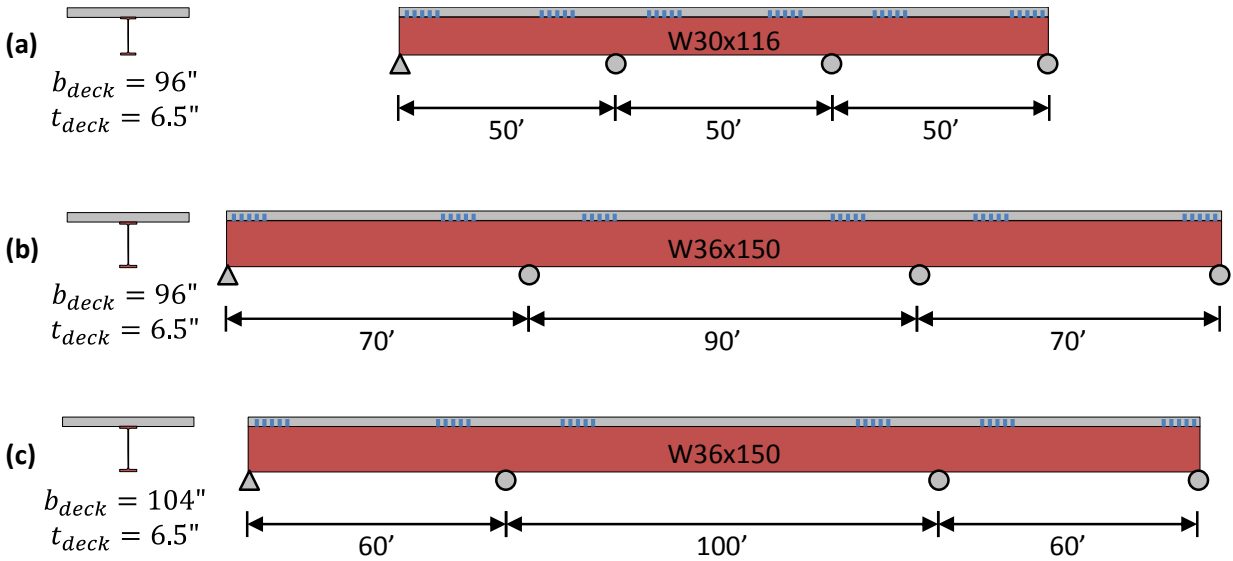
Bridge Girders Considered in the Parametric Studies
